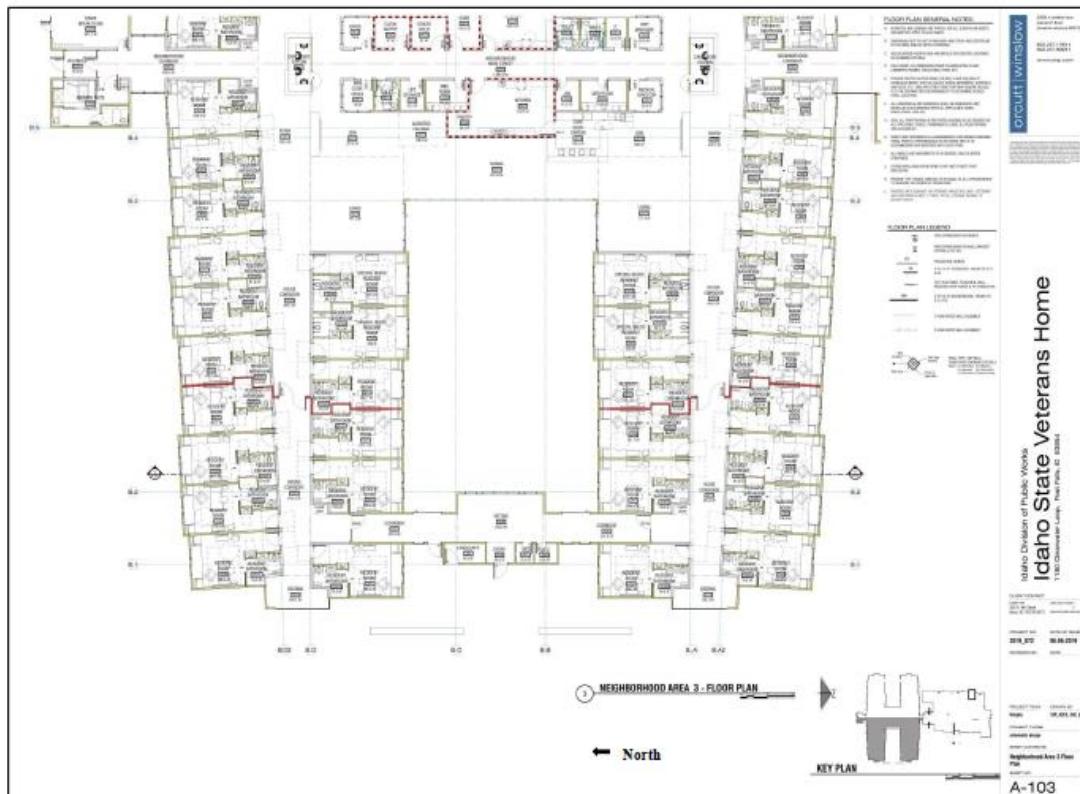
Neighborhood Area 3 Floor Plan A-103. The south building.
